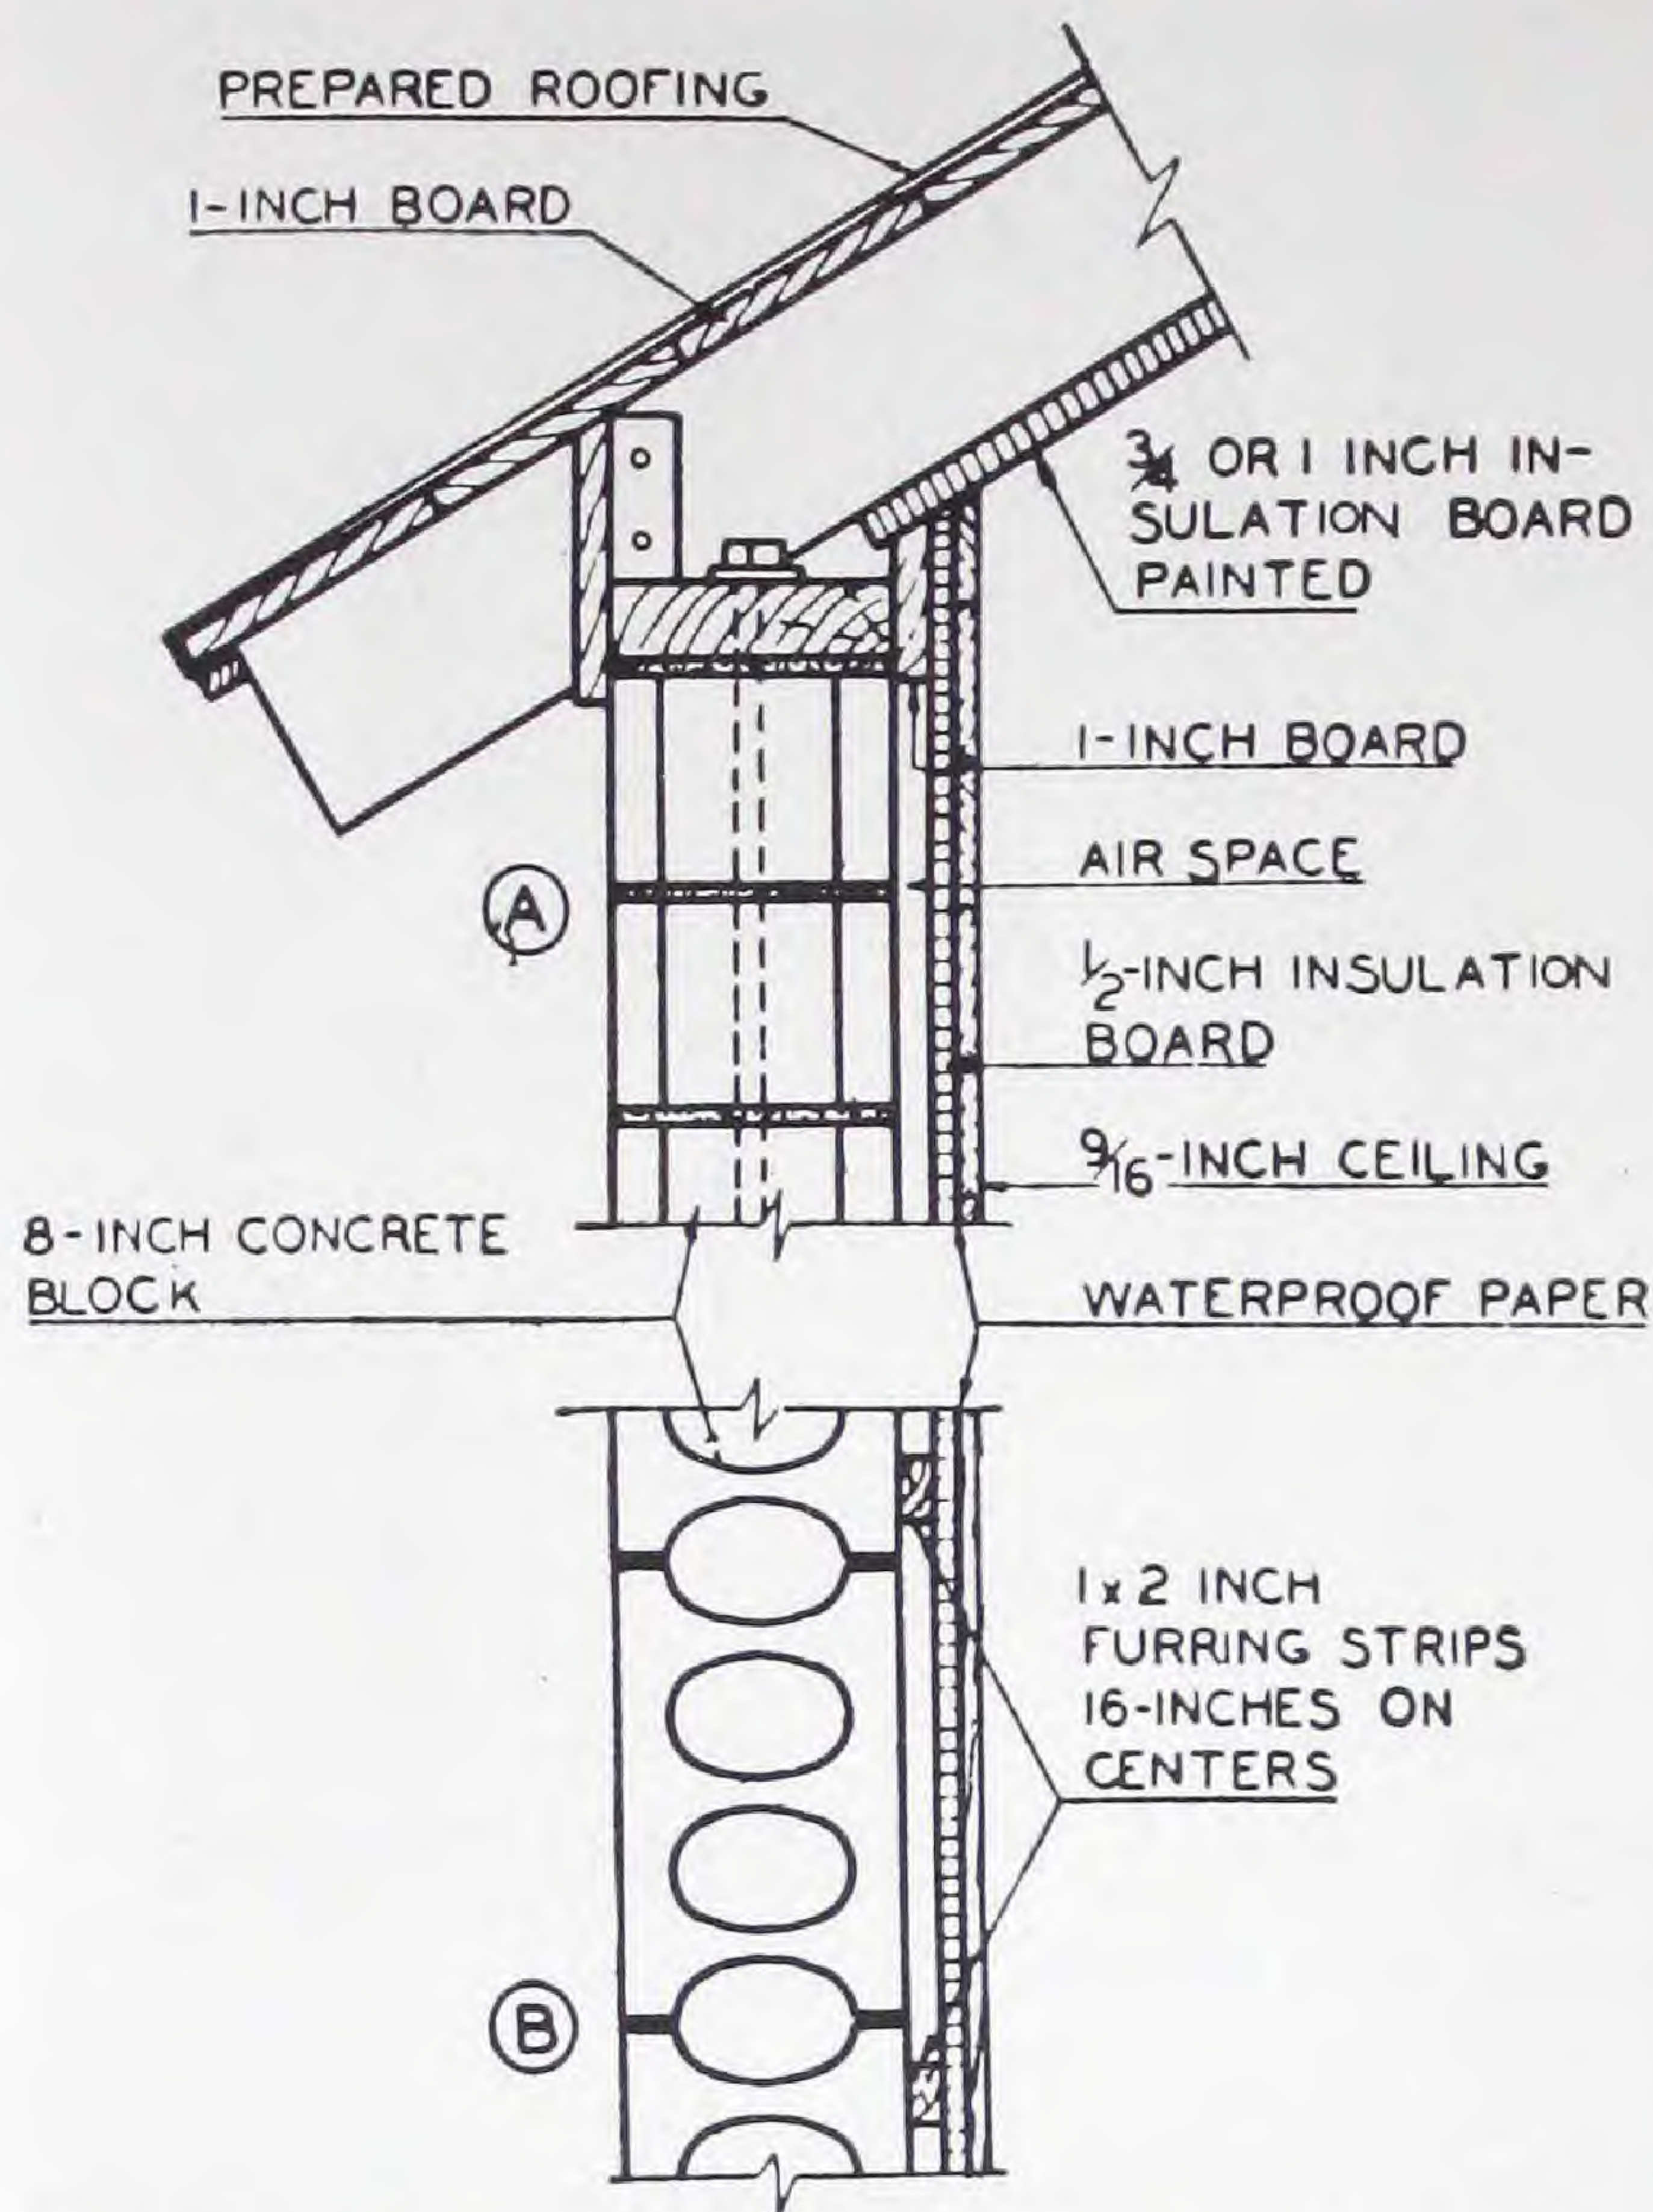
Insulated masonry hog-house construction. A is a vertical section through wall and roof; B is a horizontal section through wall.
